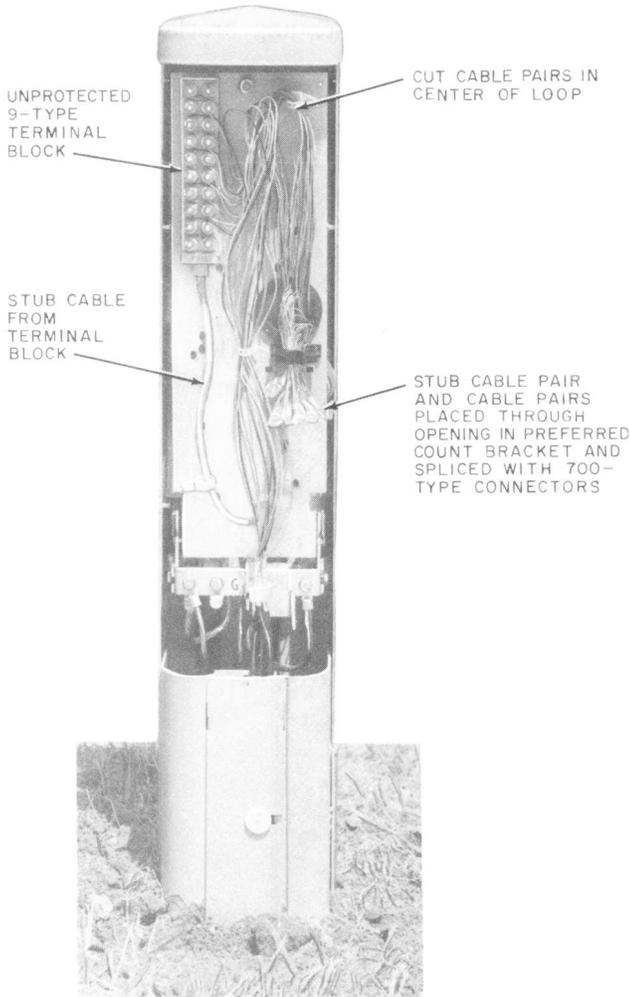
Preferred Count PC6/48 Cable Closure With Unprotected Terminal Block—Typical for PC12/55 Cable Closure
